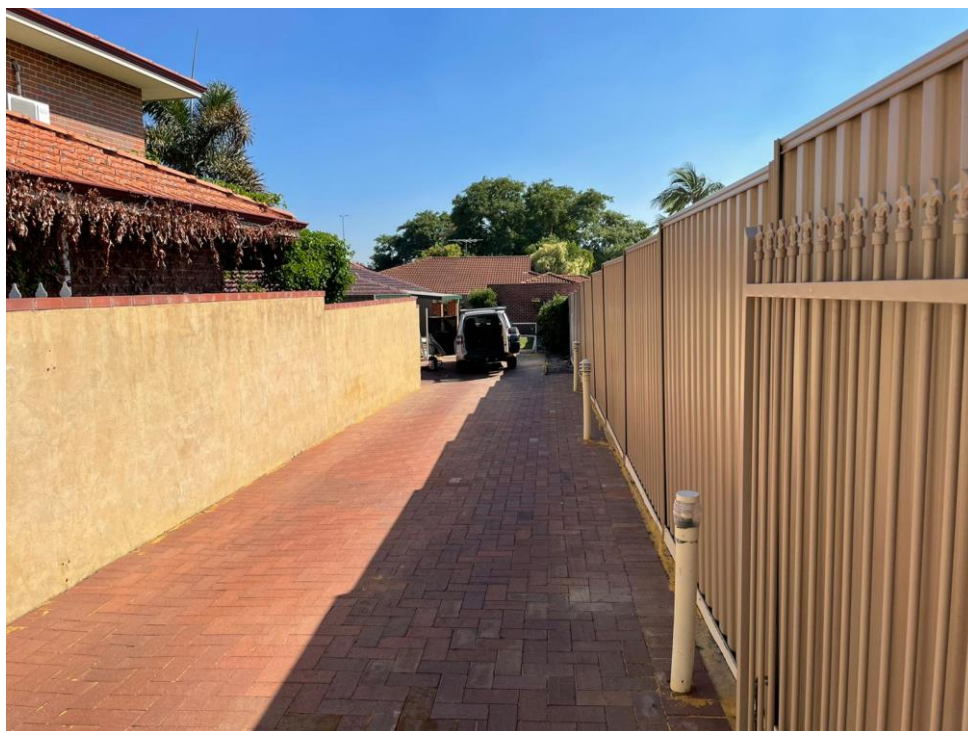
The proposed western boundary wall will abut the access way of 25A Doney Street, Alfred Cove, therefore having no bulk impact as viewed from any habitable spaces.
